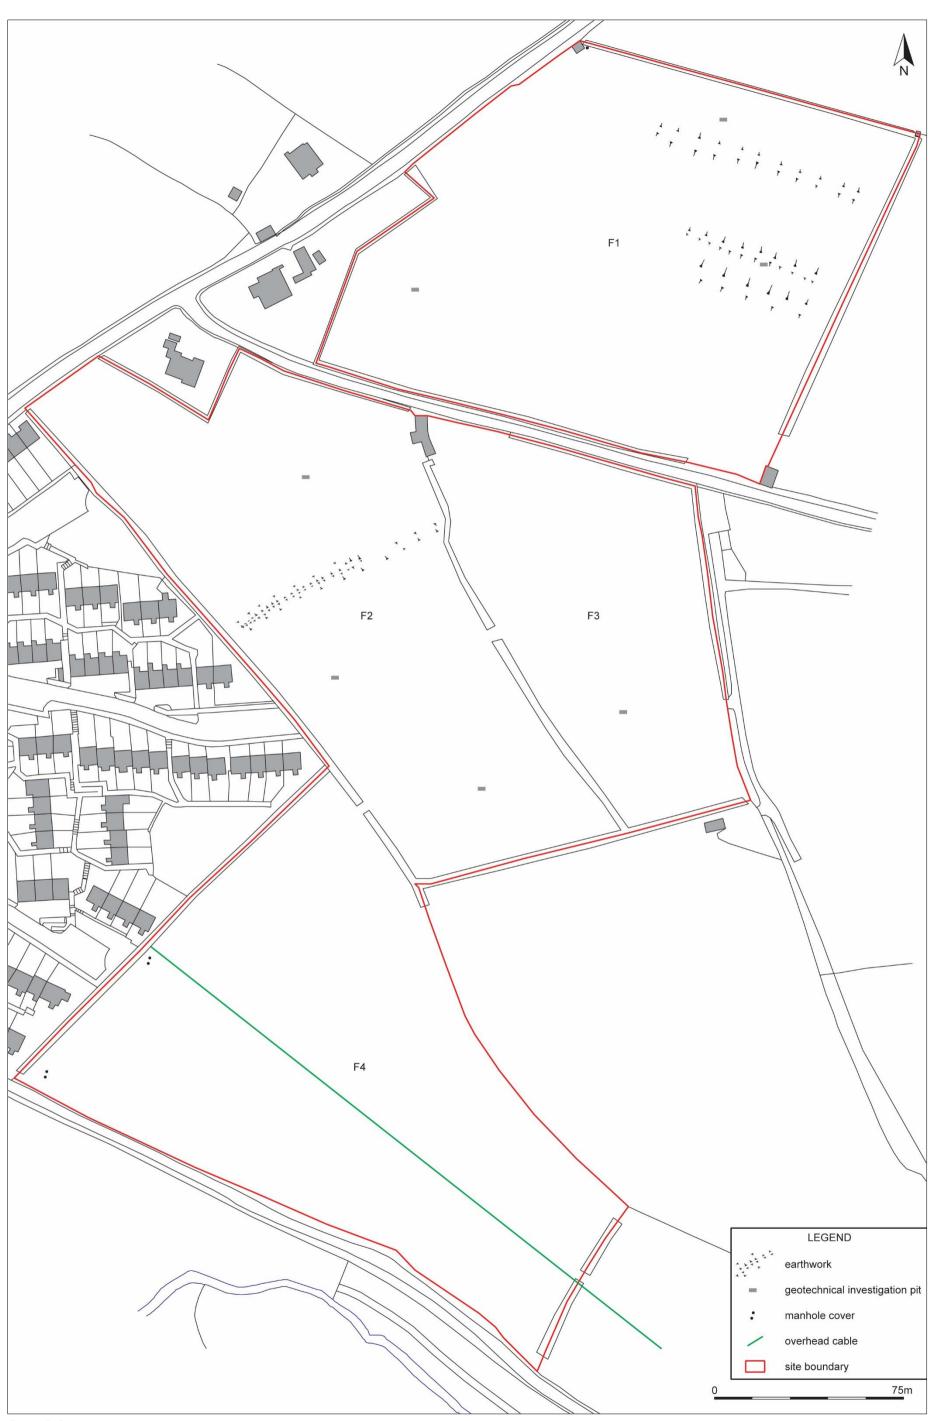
SITE PLAN SHOWING FIELD LAYOUT AND APPROXIMATE POSITIONS OF FEATURES NOTED DURING SITE INSPECTION.
